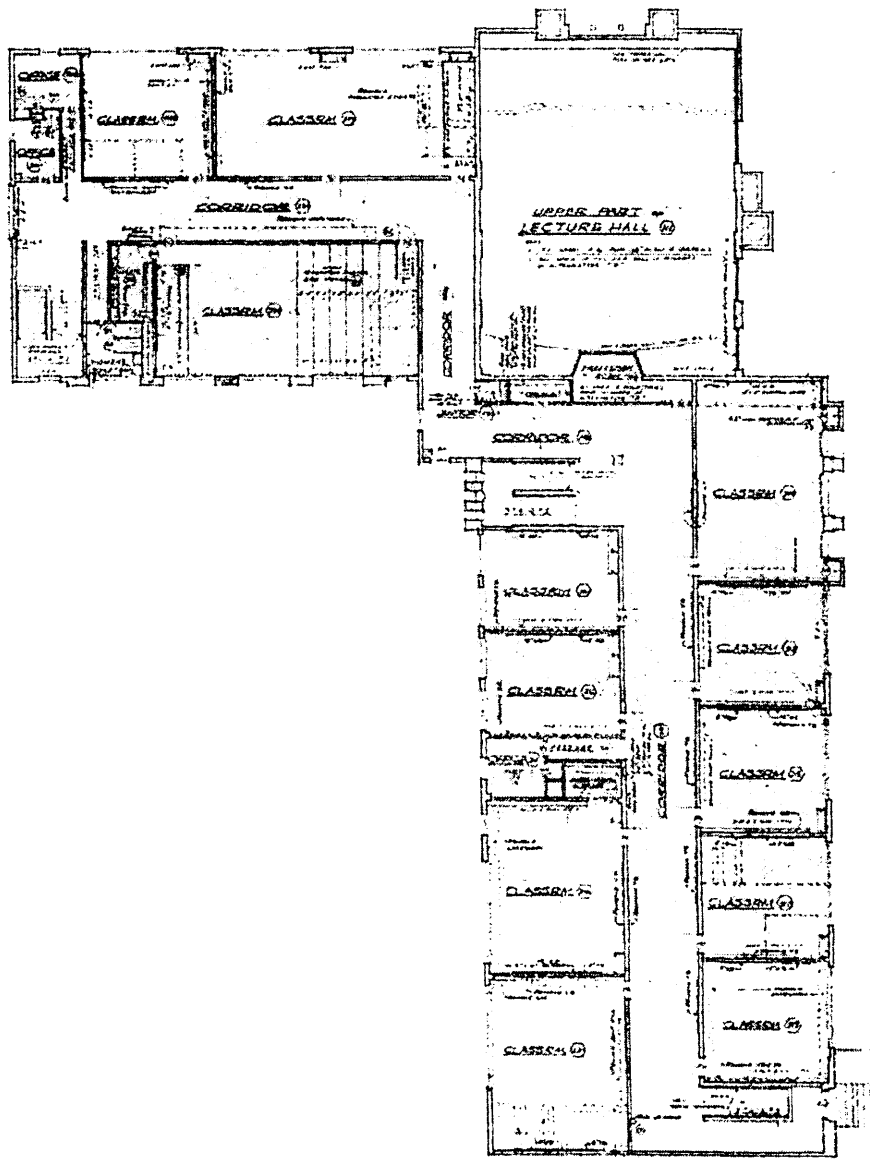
Richardson Hall, ground floor plan, 1930 Training School Wing with auditorium.
